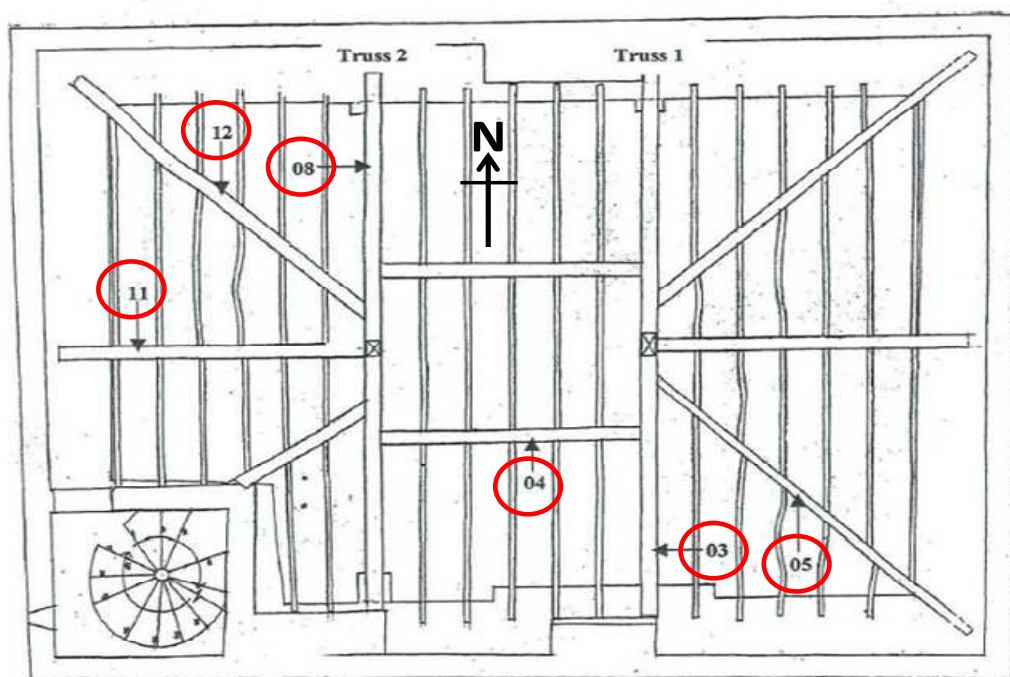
Plan at second floor ceiling level to help locate sampled timbers (after Department of the Environment)
